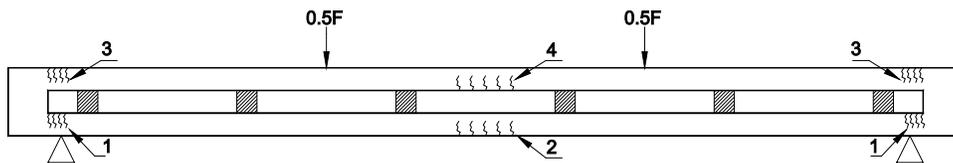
Cracking pattern of tested PICP with end-beams.
